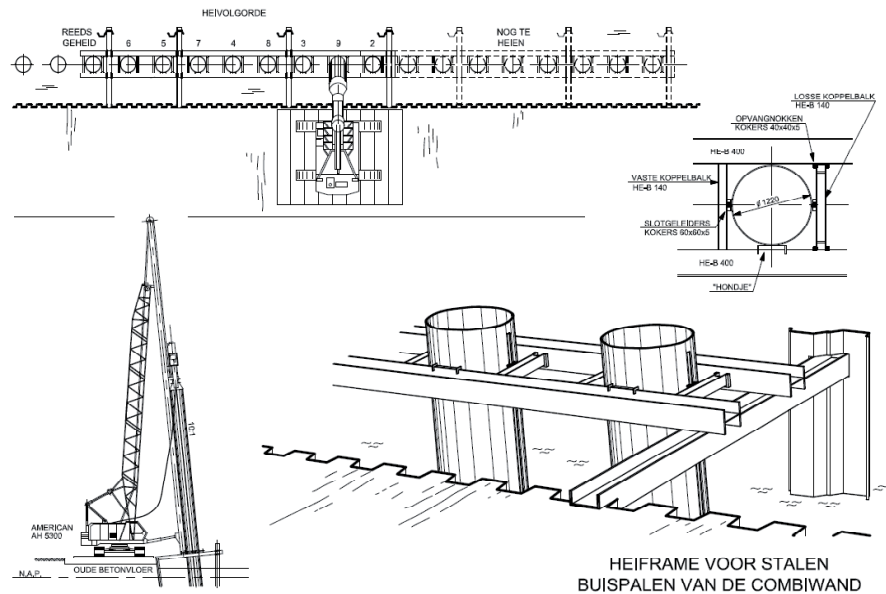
Guiding frame for the installation of combi wall system [de Gijt 1996]
